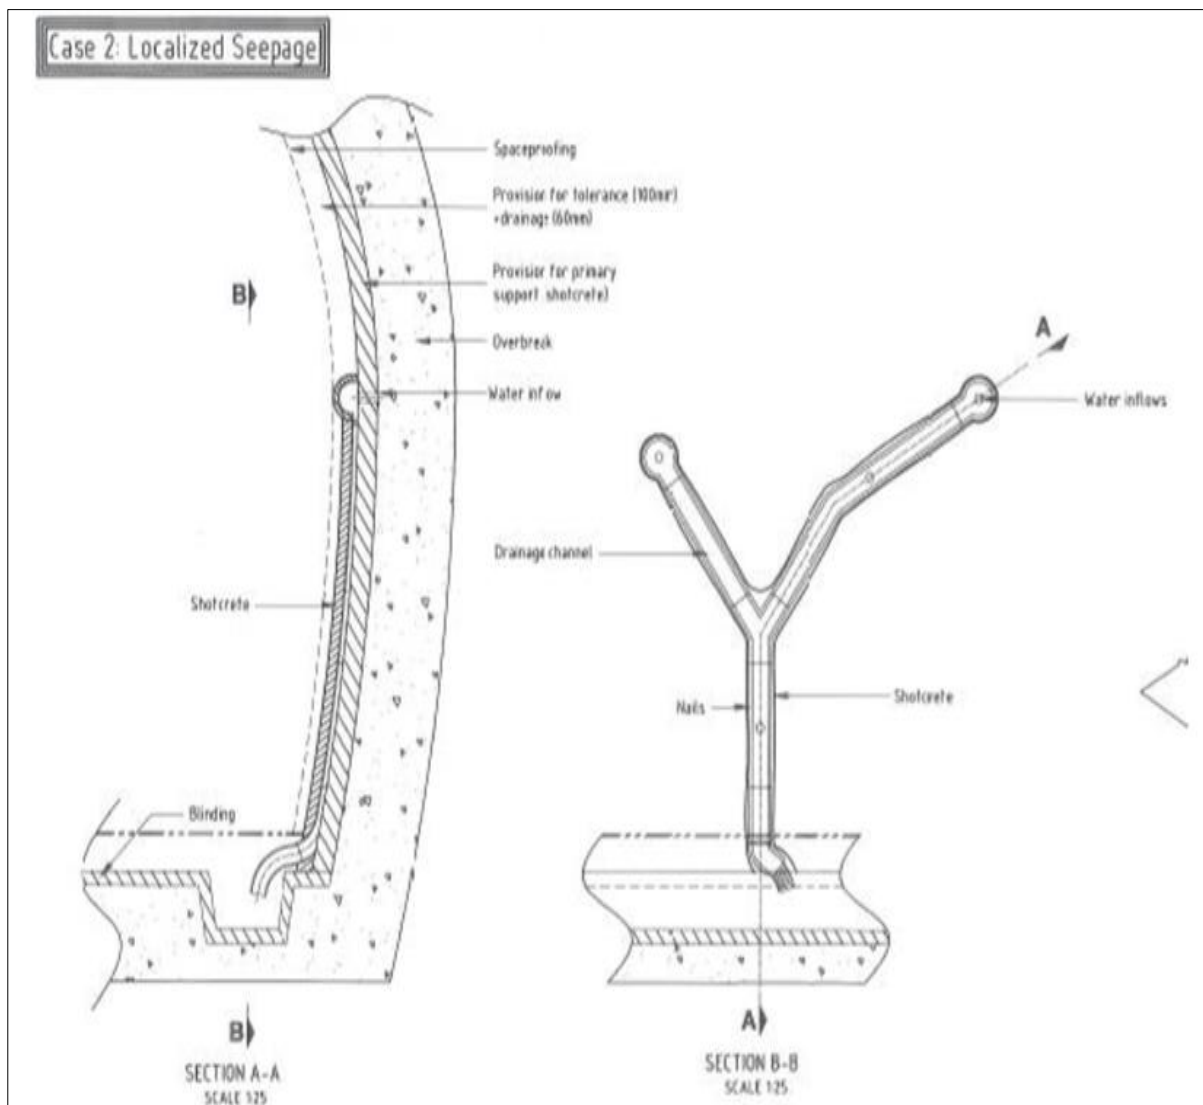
Schematic illustration of localized tunnel drainage (Iliso Consulting, 2010).
